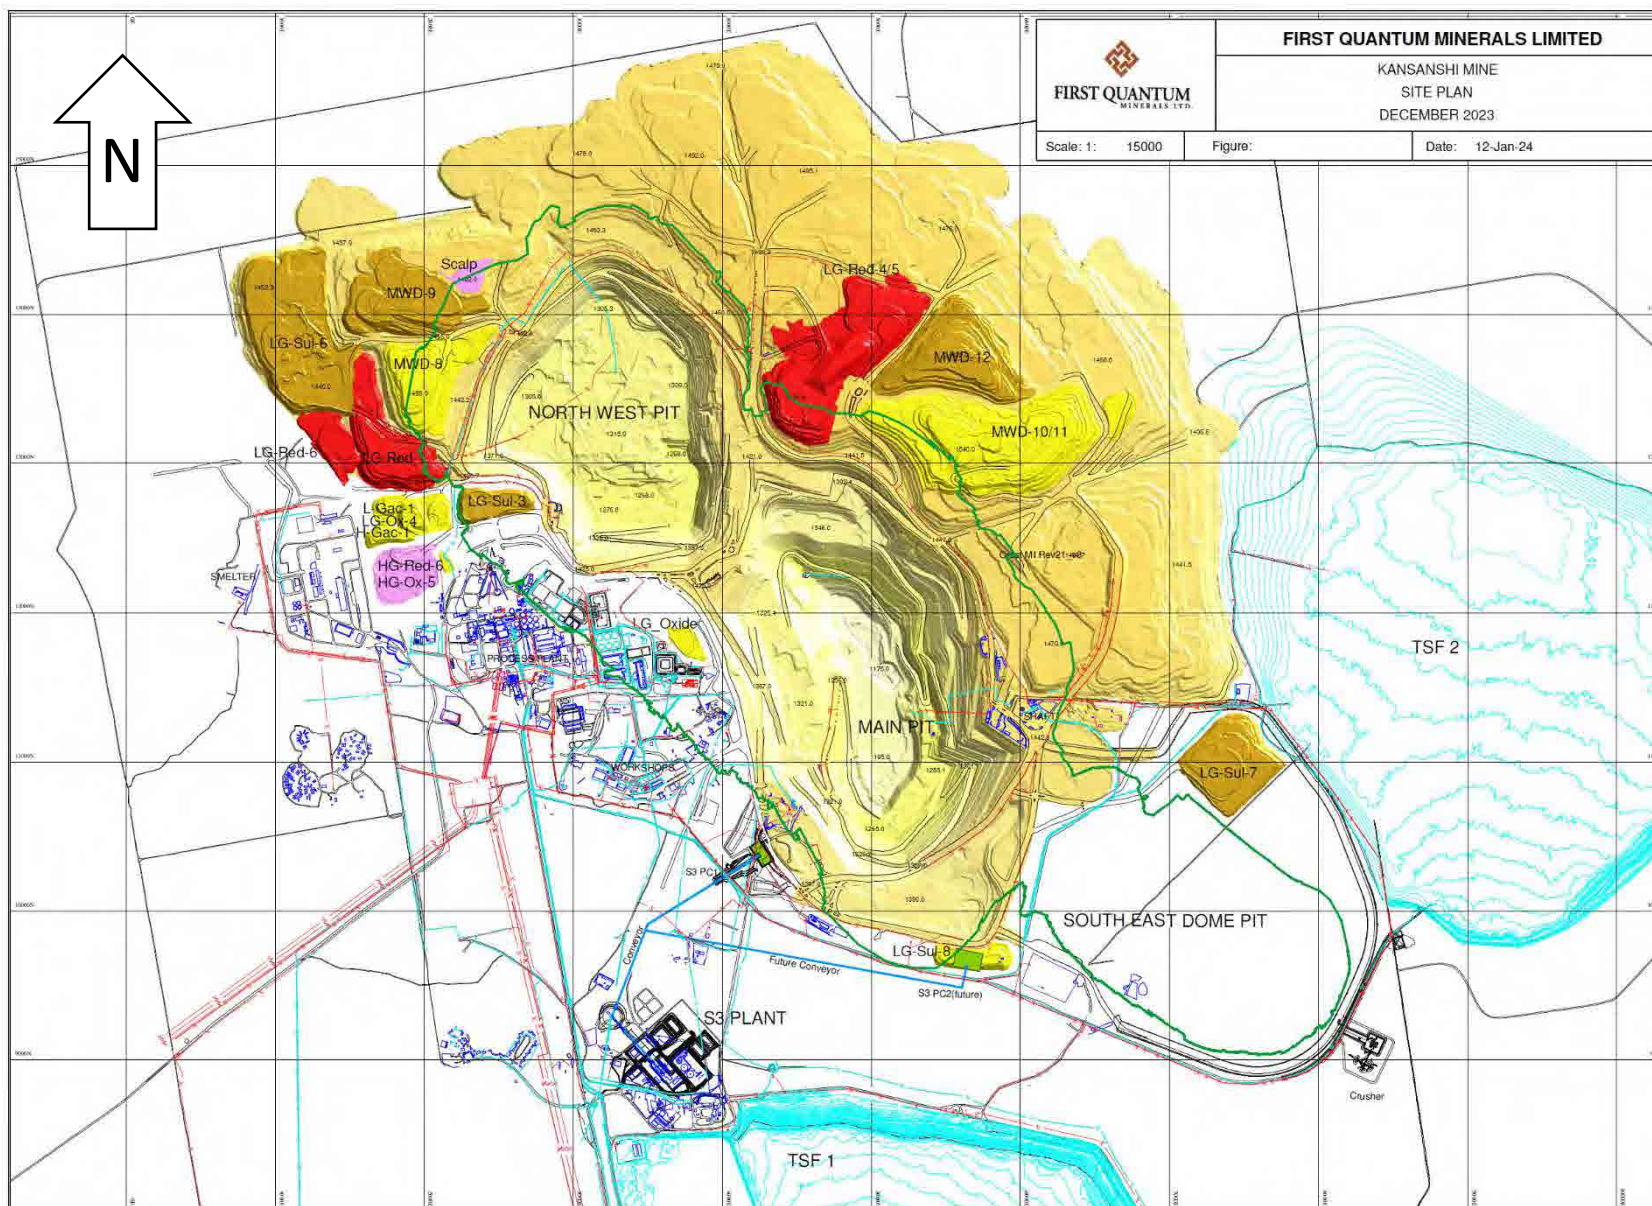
Main and North West ultimate pit designs, December 2023 (source: FQM)
